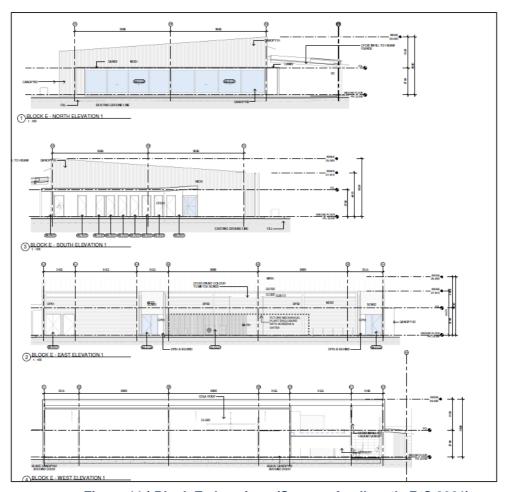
| Block E elevations (Source: Applicant's RtS 2021)
